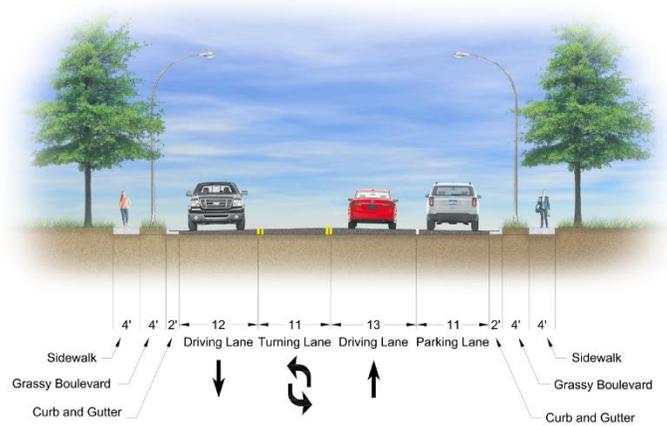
TYPICAL CROSS SECTION SOUTH OF 7TH AVENUE
